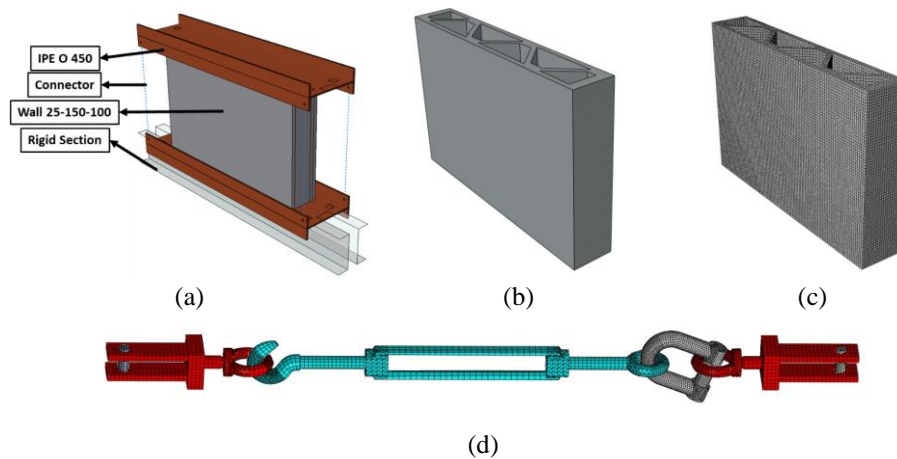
Numerical Simulation Model Details: (a) the Experimental Setup, (b) Wall Details, (c) Mesh Details of the Wall, and (d) Mesh Details of the Tension Bar System
